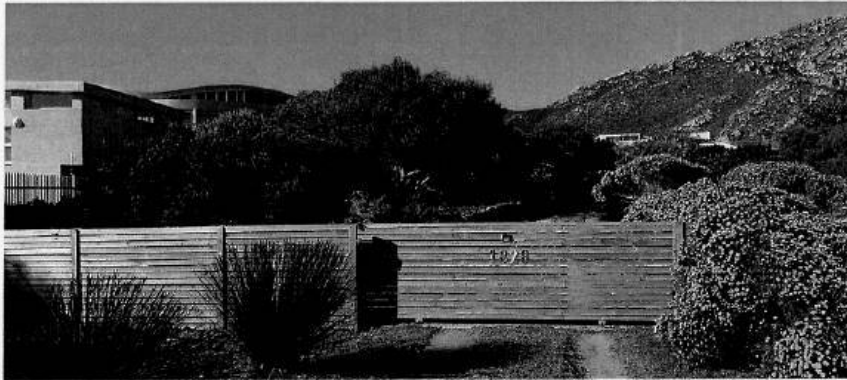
Photo showing existing gate structure in relation to the boundary, as well as the built structures on adjoining Erf 540.
